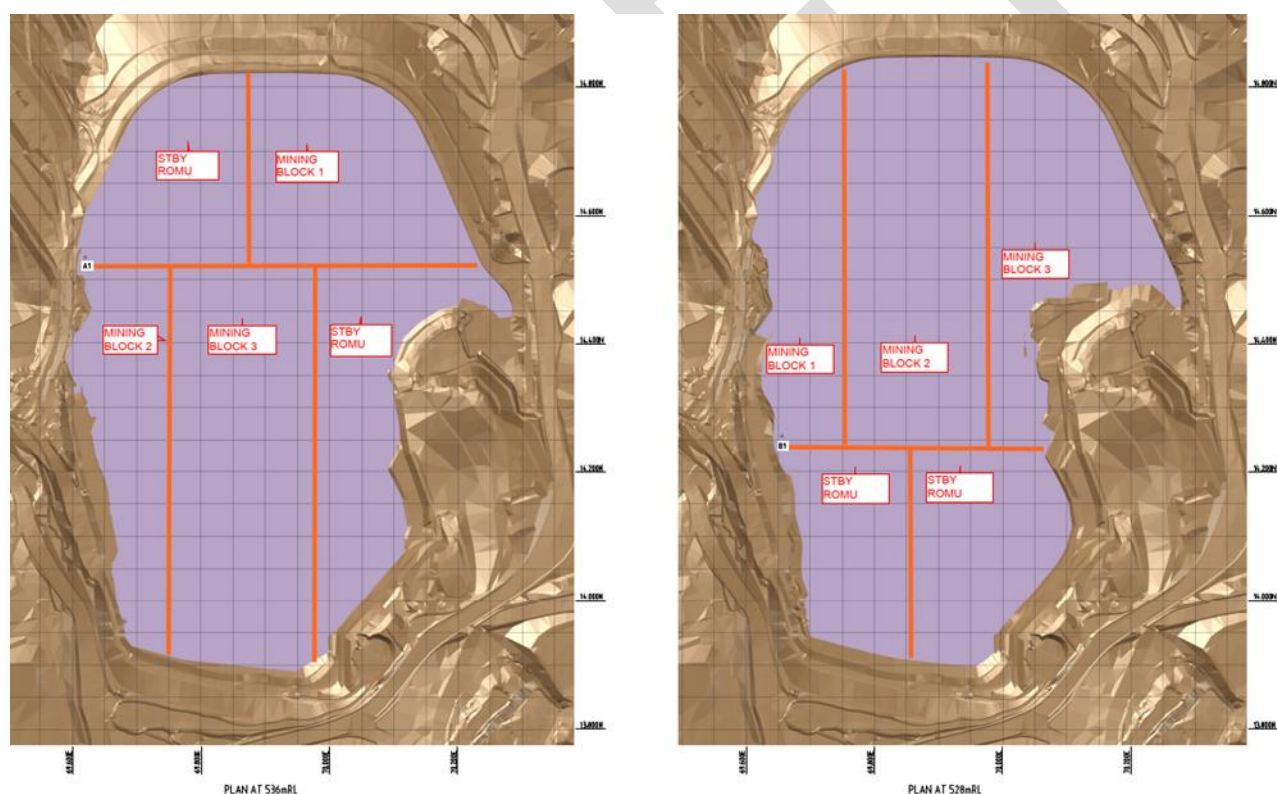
RL536 - RL528 Mine Plan Layout SP11
